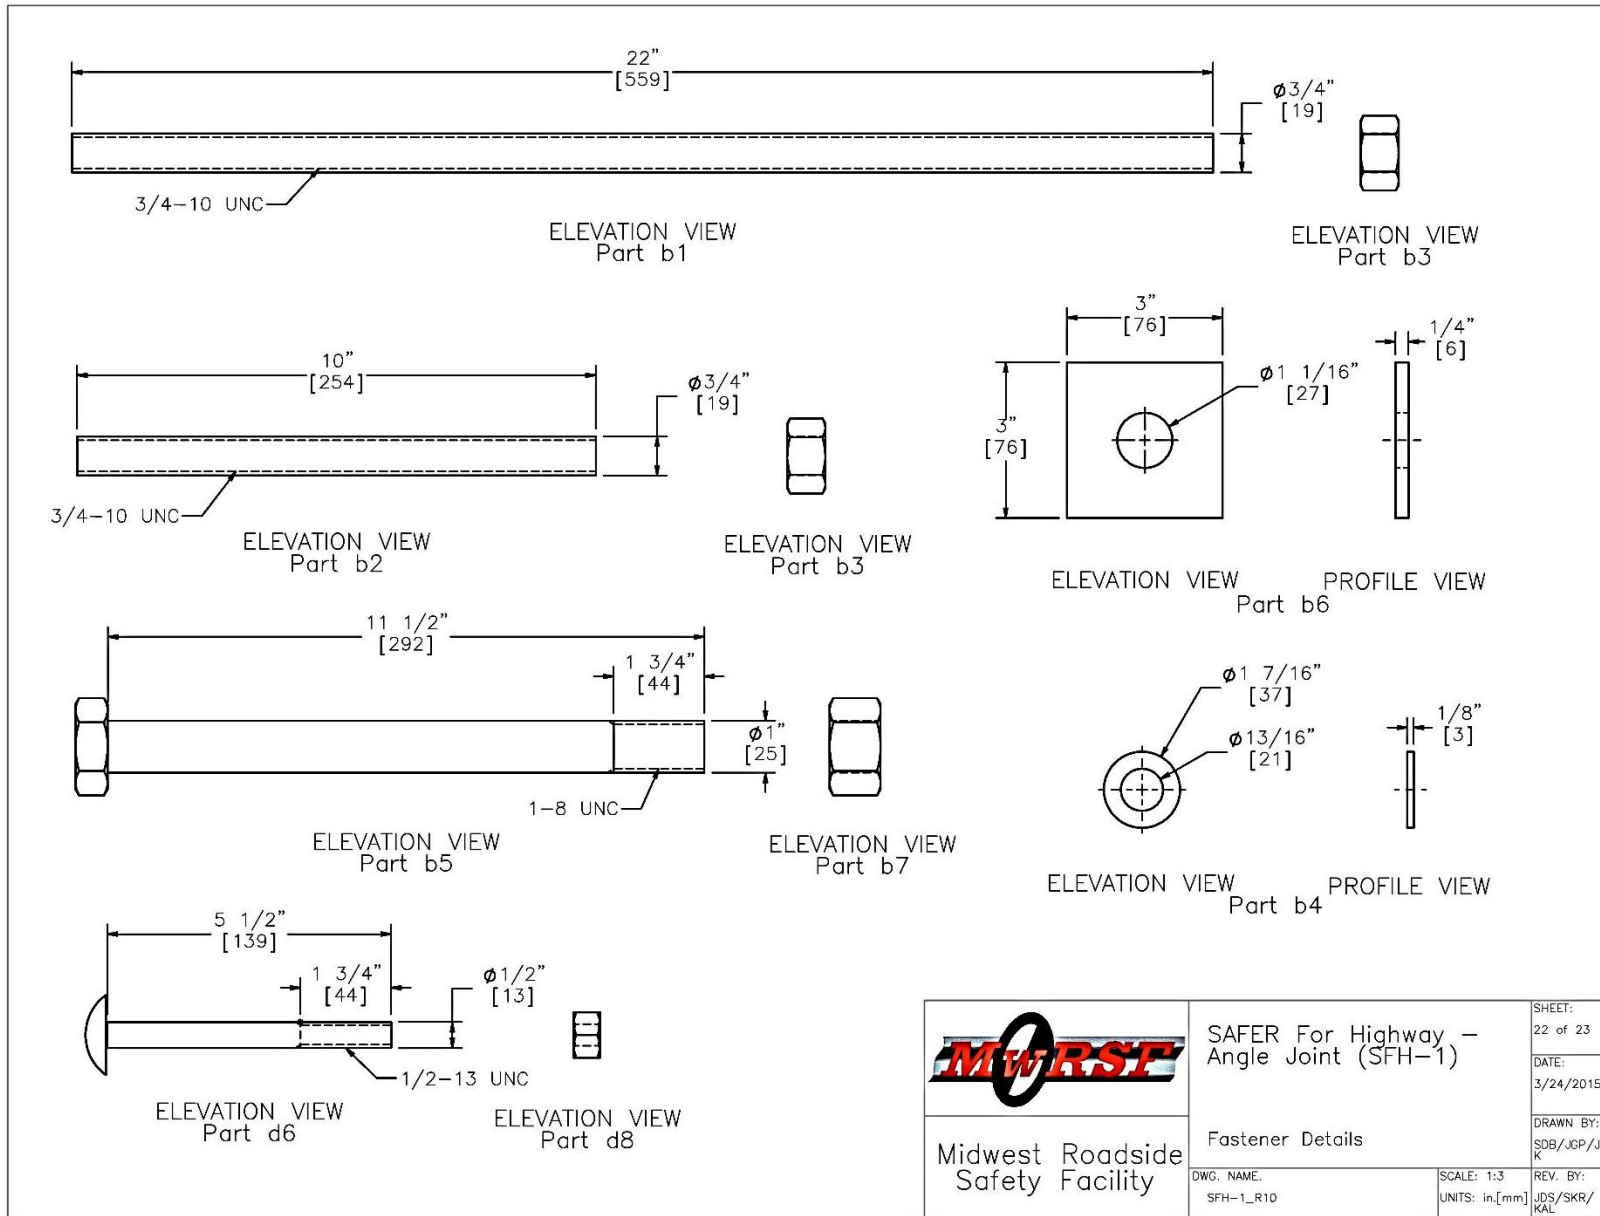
Fastener Details, Test Nos. SFH-1 and SFH-2
